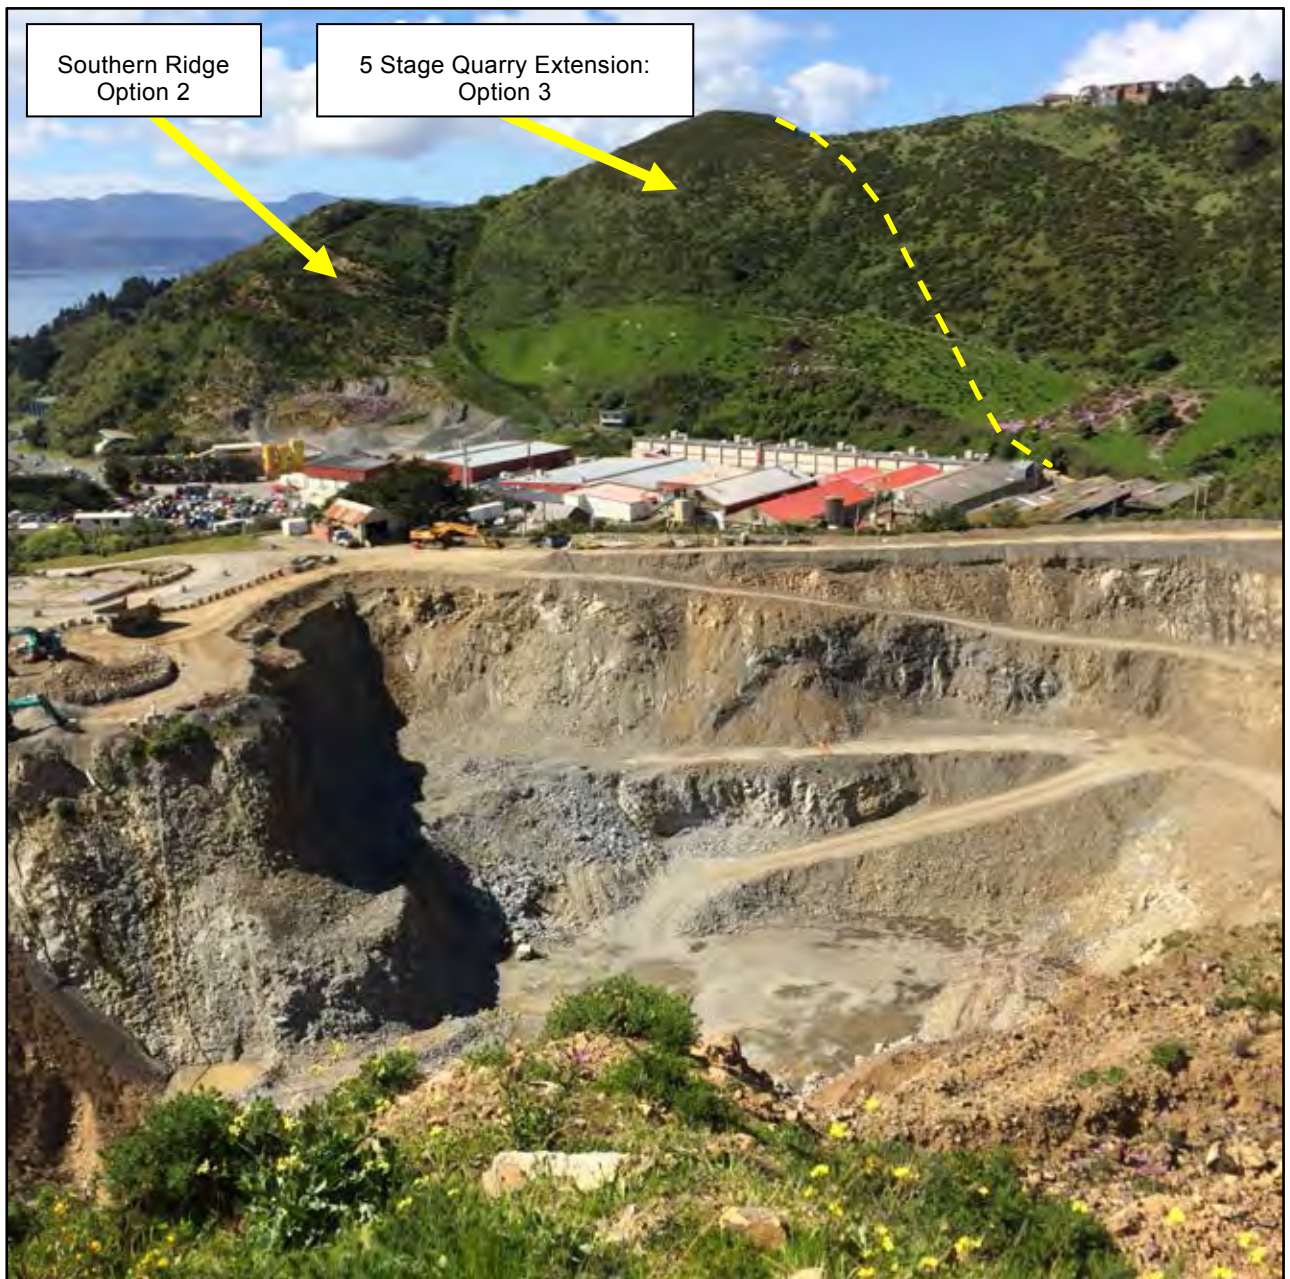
Photograph of the Existing Quarry Pit (Area C) Southern Ridge Looking SSE
